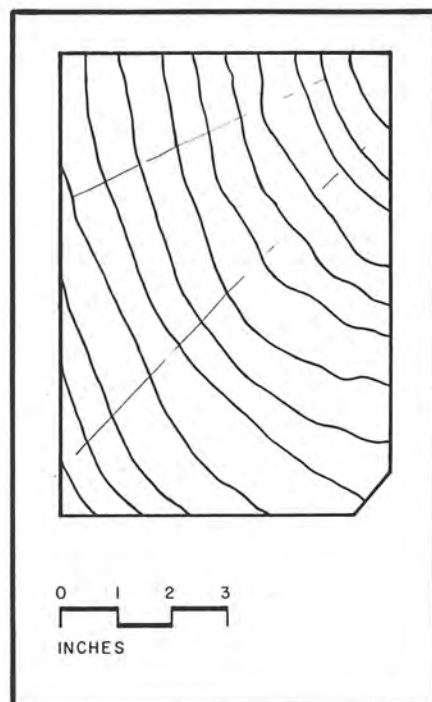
Matthew Jones House, section through rear plate showing chamfer on lower edge.
